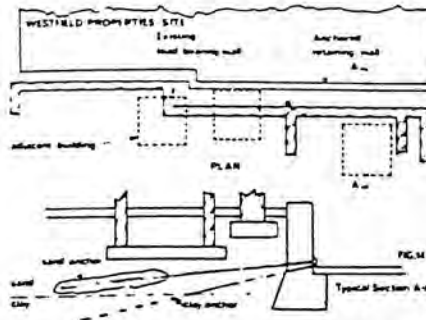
Use of sand and clay anchors at Westfield Properties site in Durban.
